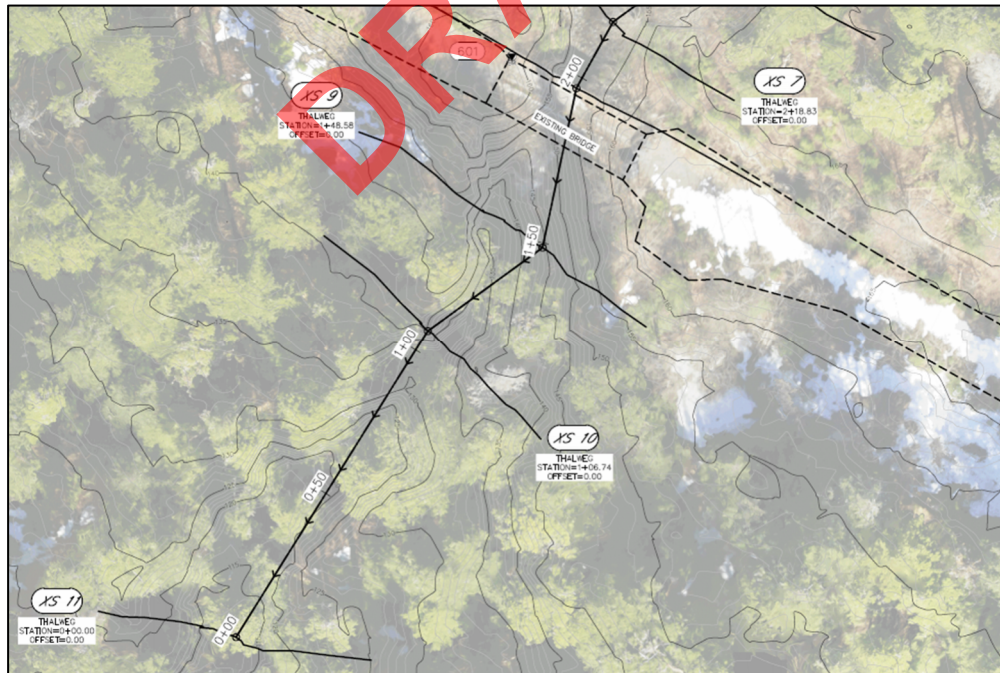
Surveyed cross-sections downstream of the existing bridge.
